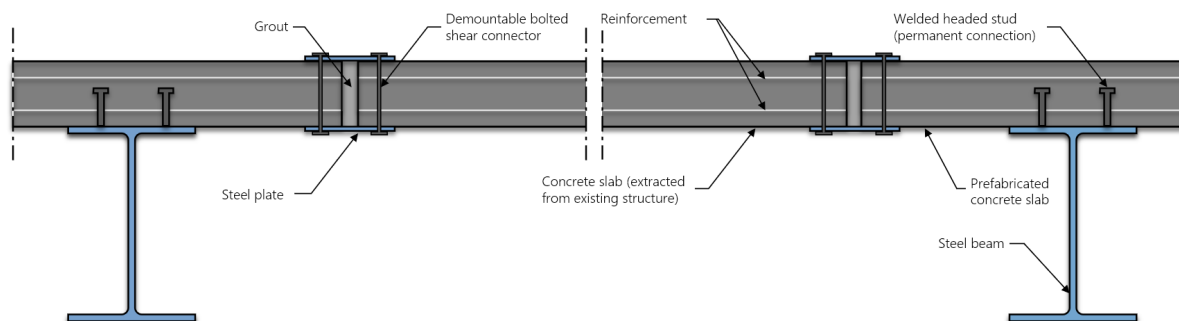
Demountable steel-concrete composite floor system utilising concrete deck-to-deck connections (not in scale)
